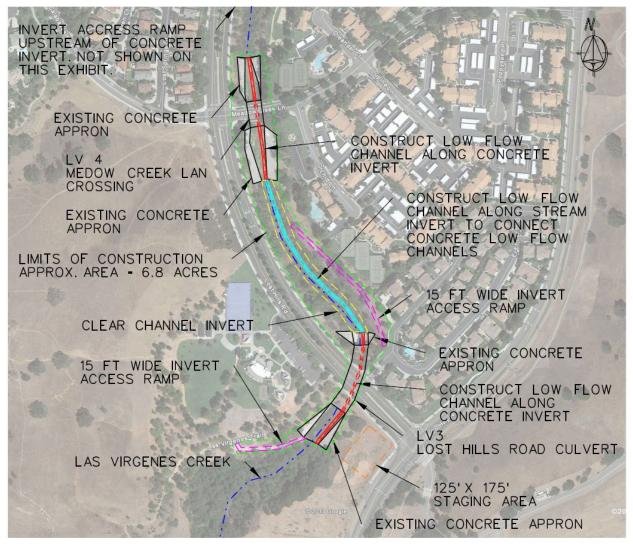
LV3 and LV4, Lost Hills Road Culvert and Meadow Creek Lane Crossing Schematic Design
